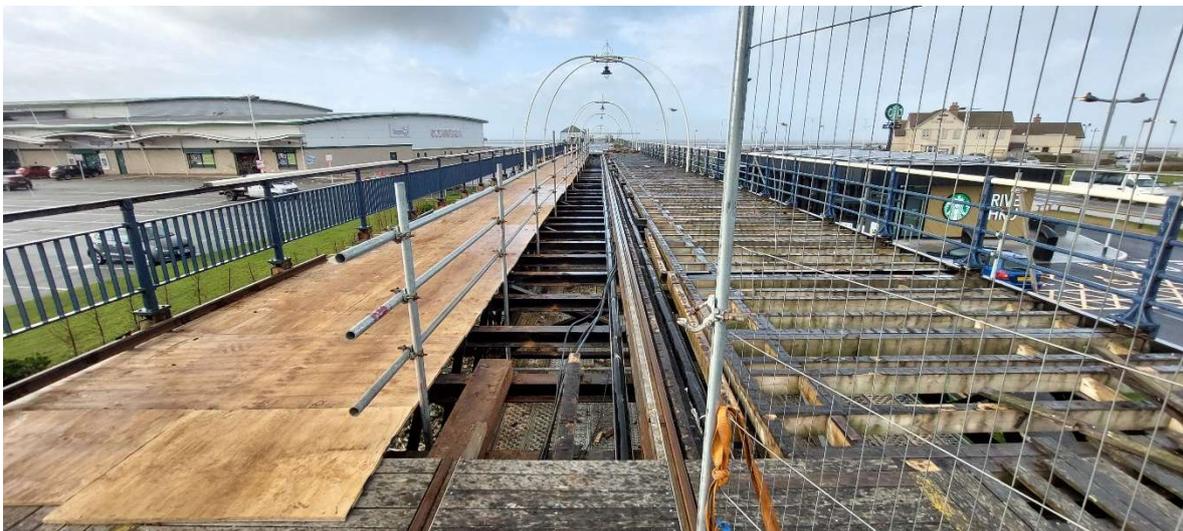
View on North section of TF23, Bay 45, looking seaward
